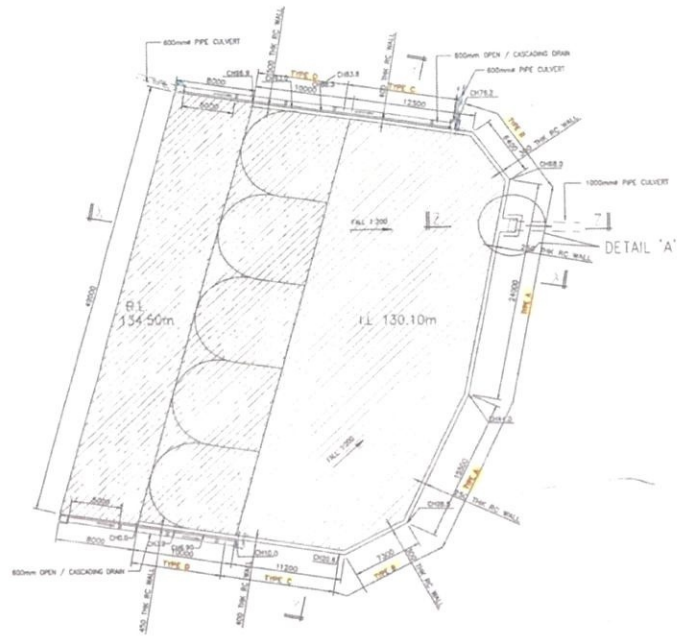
Onsite Storm Water Detention Pond layout 1
